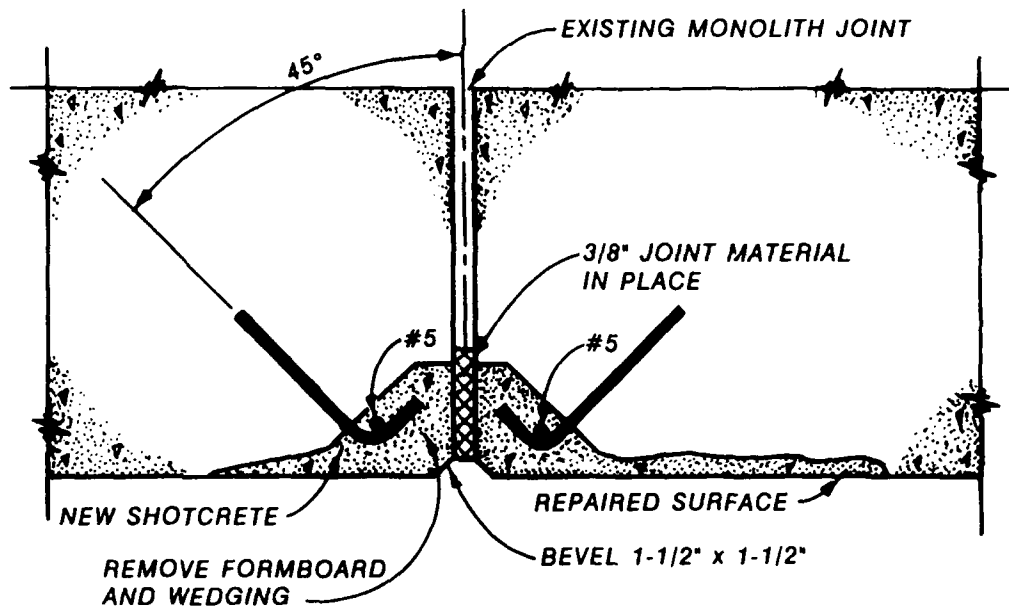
Shotcrete monolith joint repair details, Emsworth Locks
